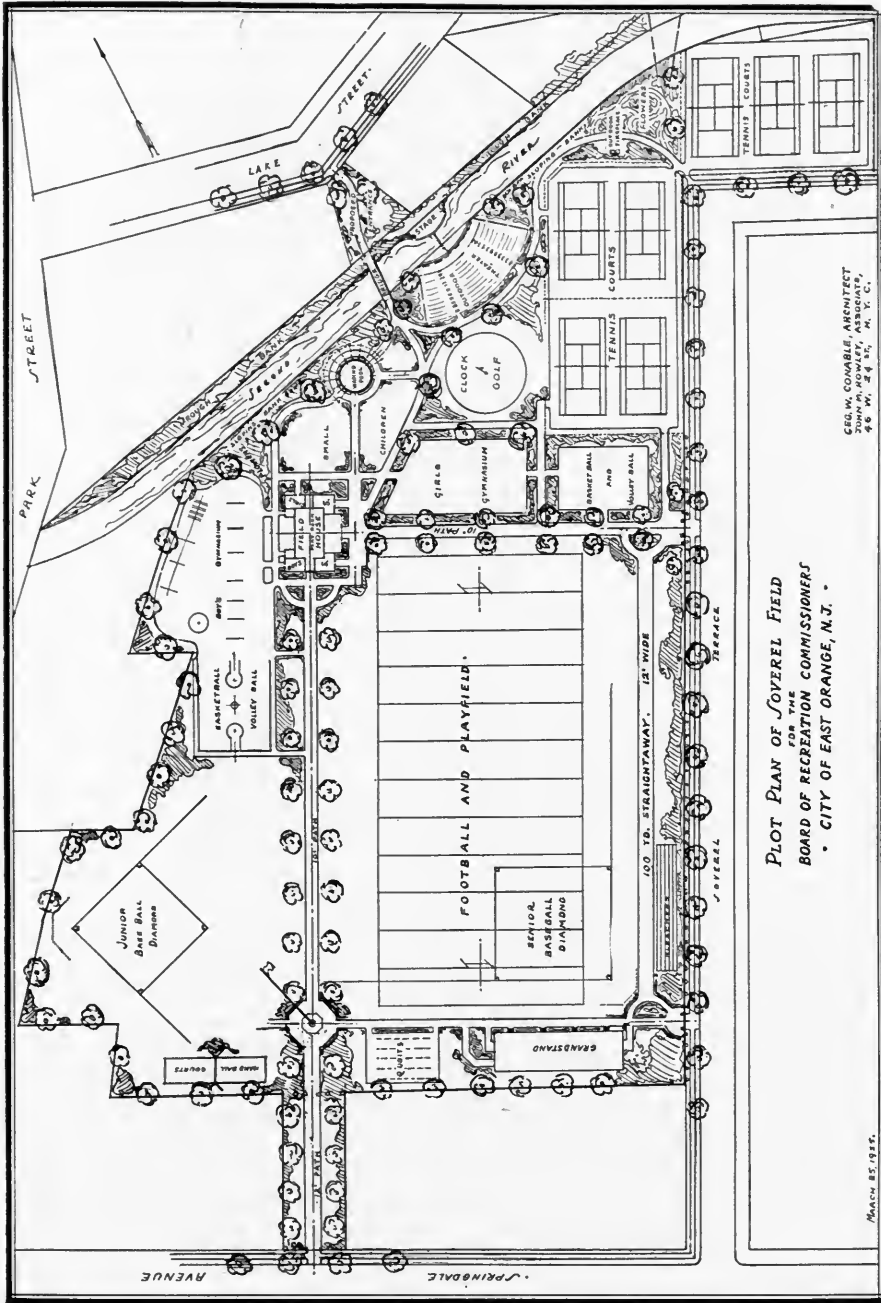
PLOT PLAN OF SOVEREL FIELD, BOARD OF RECREATION COMMISSIONERS, EAST ORANGE, NEW JERSEY
